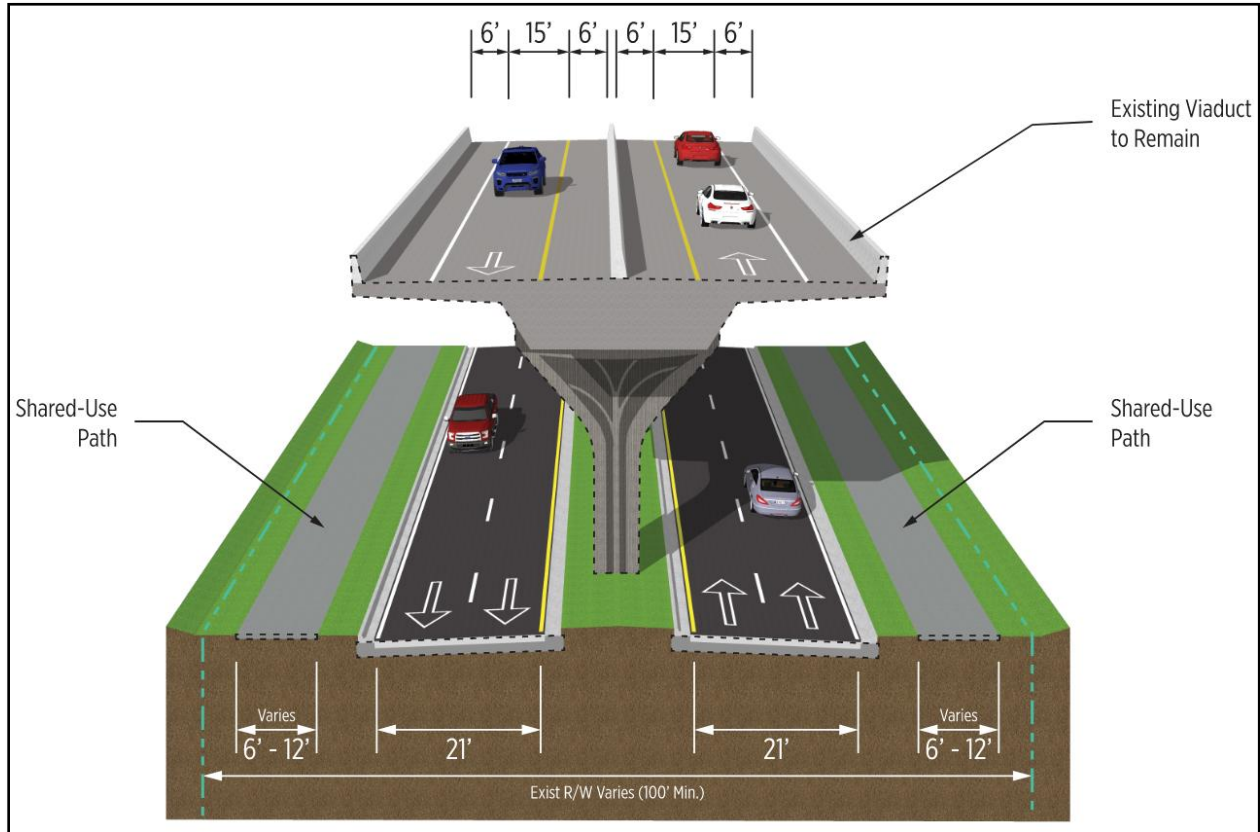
Existing Roadway Typical Section (Curb and Gutter) – Segment 3 – East end of Gandy bridges to West Shore Boulevard
